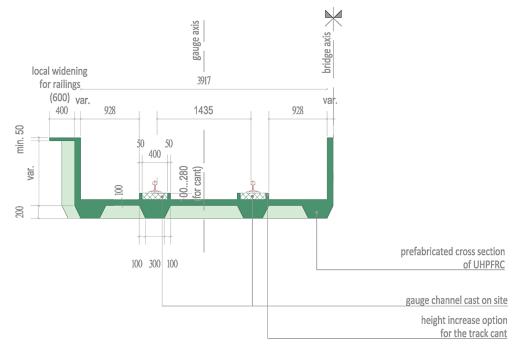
Concept 3 bridge girder with integrated fixed railway track
